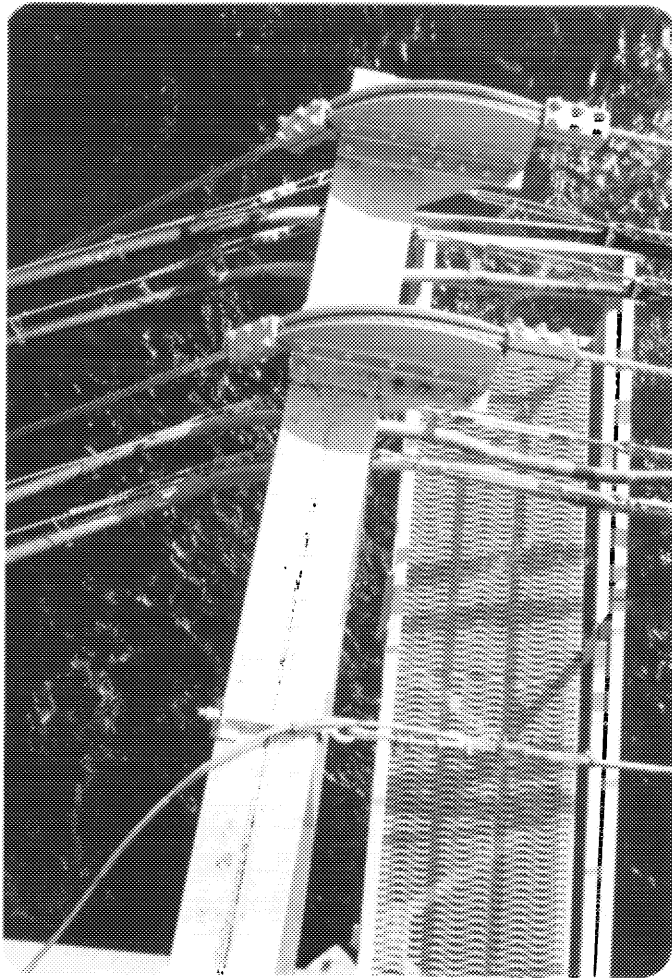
Typical corrosion and minor section loss on north tower spire metalwork.
